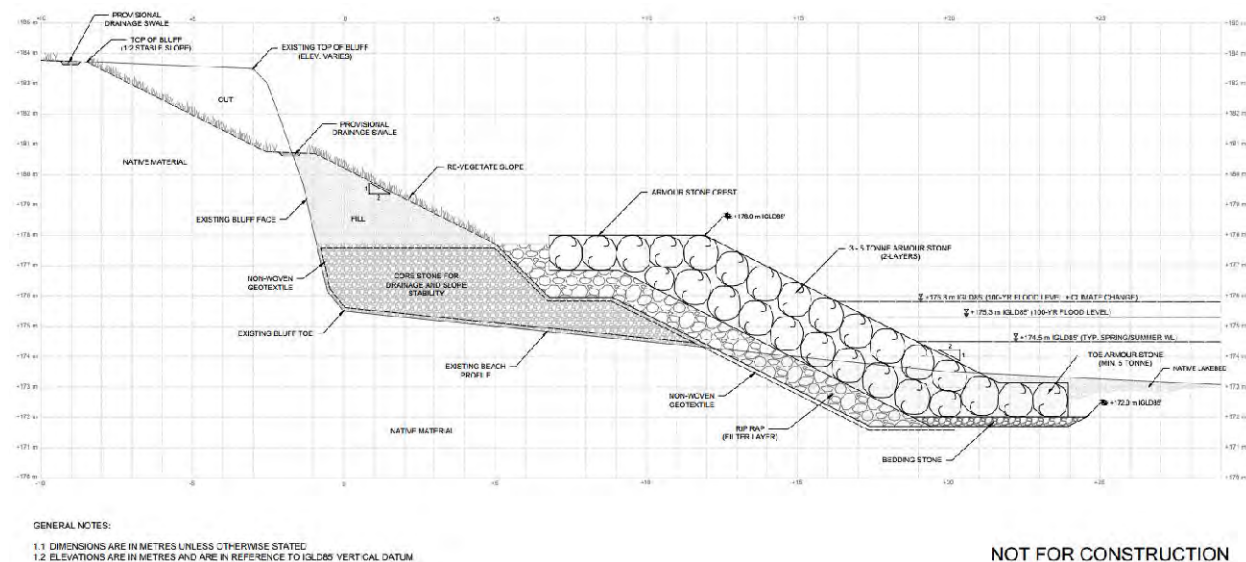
Option 1-2 Armour Stone Revetment and Slope Regrading with Drainage System
